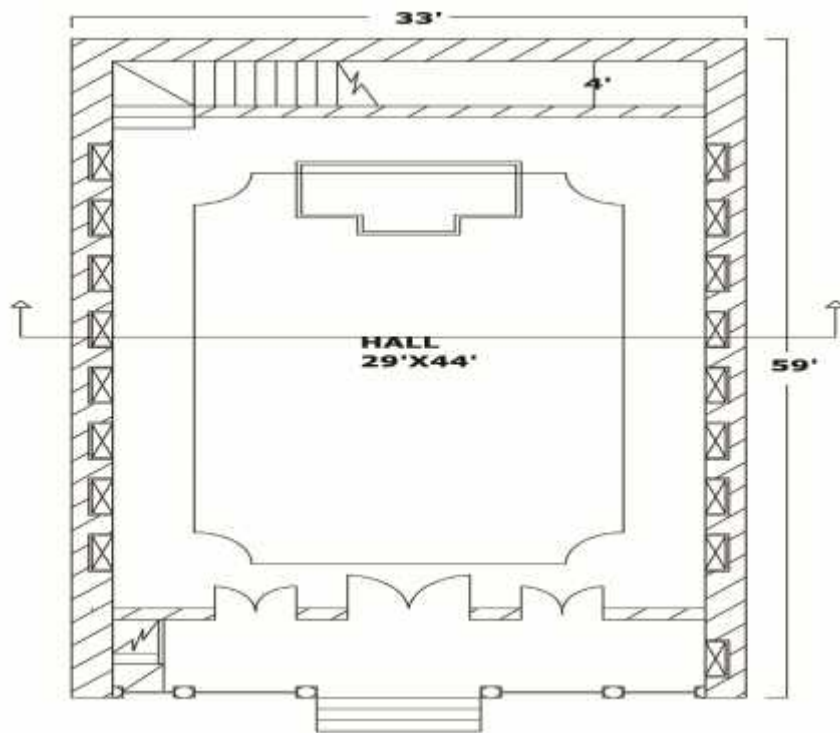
Ground Floor Plan (courtesy: Mr. Adnan Anwar)
